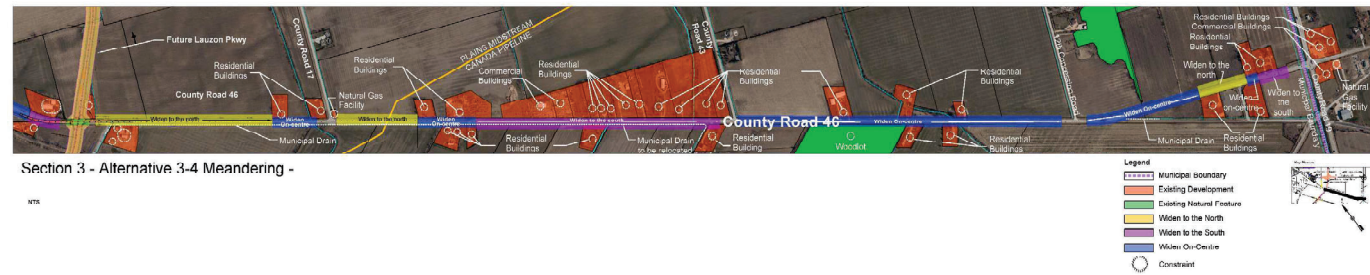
County Road 46 Section 3 Alignment Alternative 3-4
